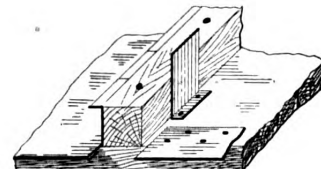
Second Strip of Tin Nailed at Edge of Roof.
